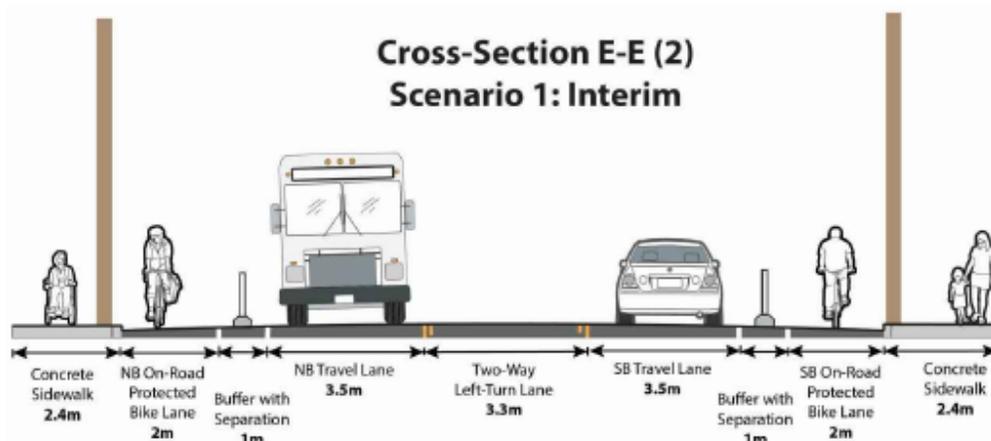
Example cross-section of interim design between Williams Lake Road and Dentith Road
